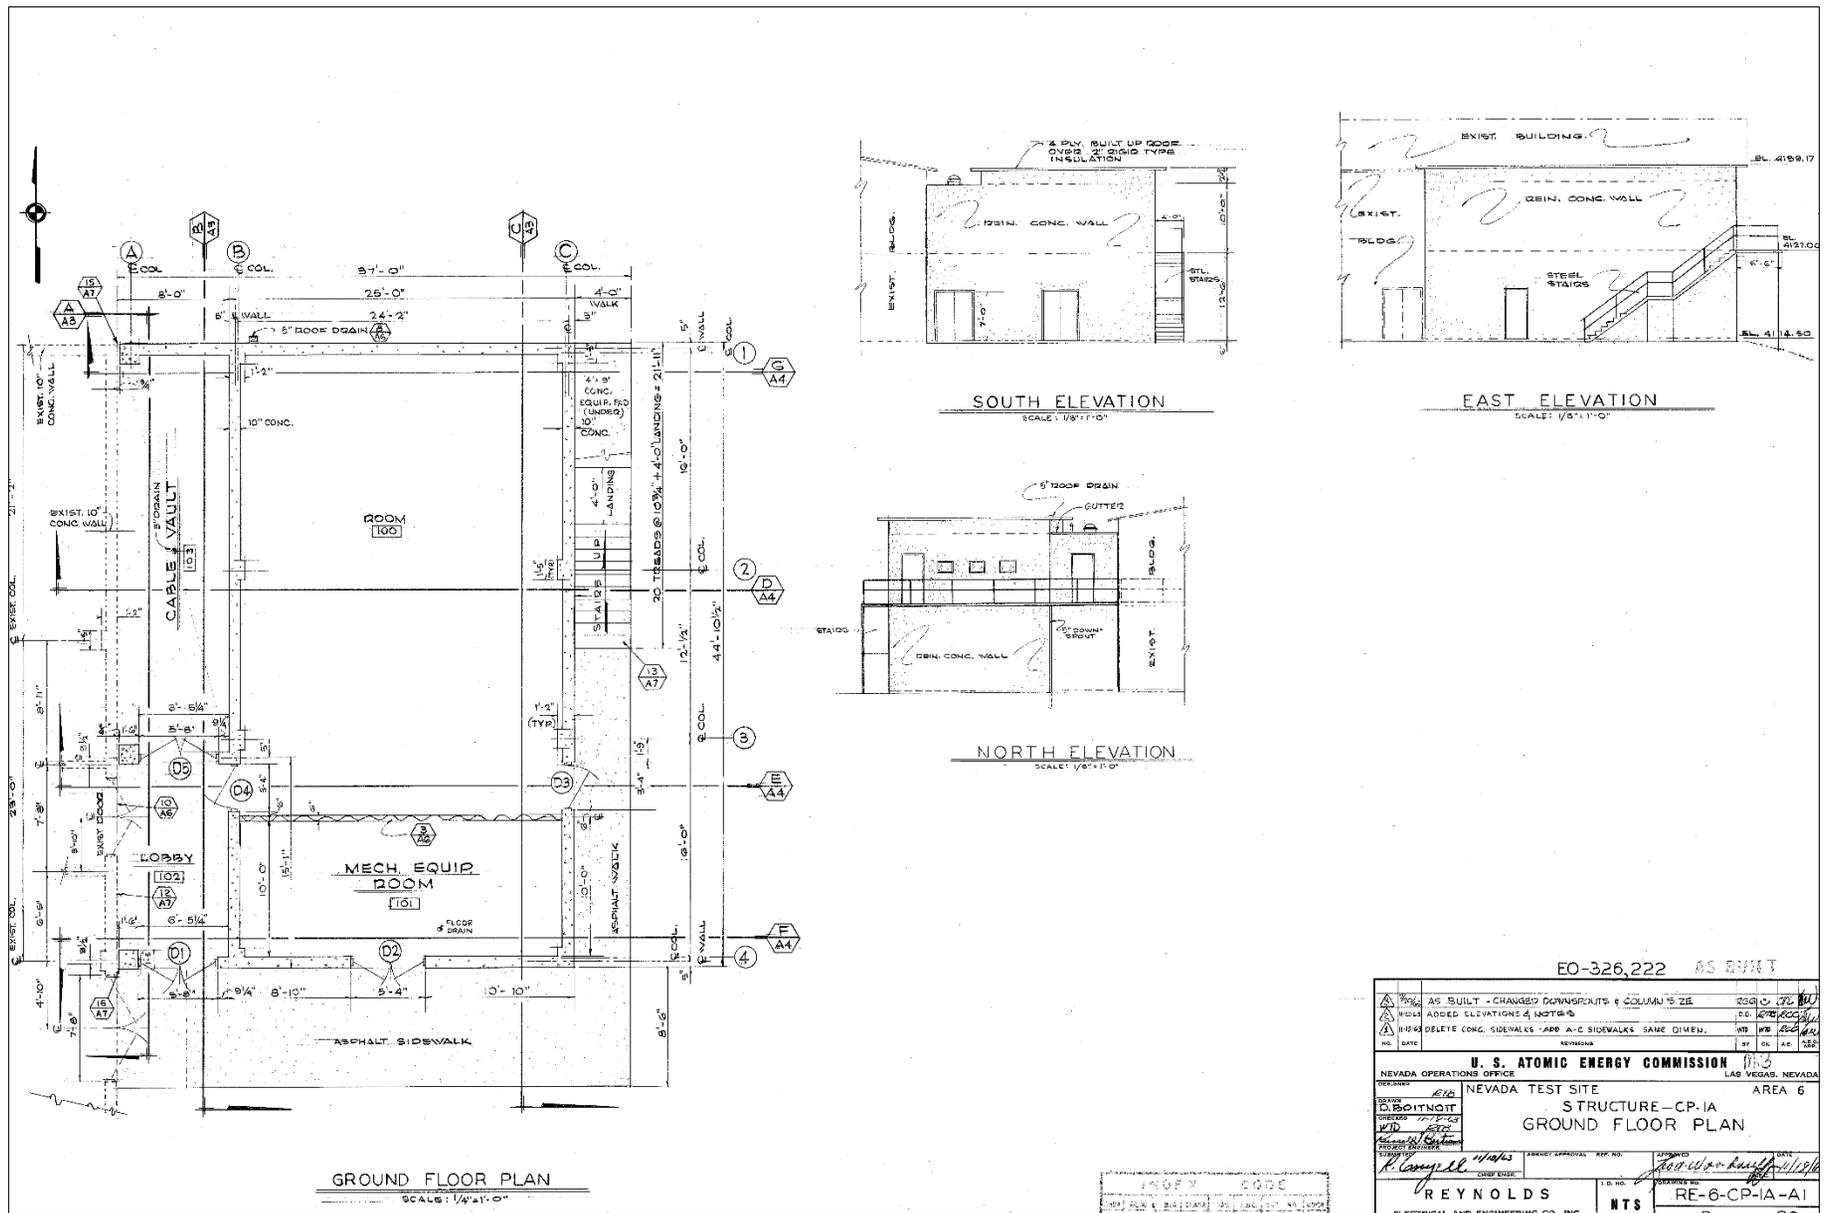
CP-1A basement plan and elevations in 1963 (drawing RE-6-CP-A-A1, 2 of 20, on file at the Archives and Records Center, Mercury).
